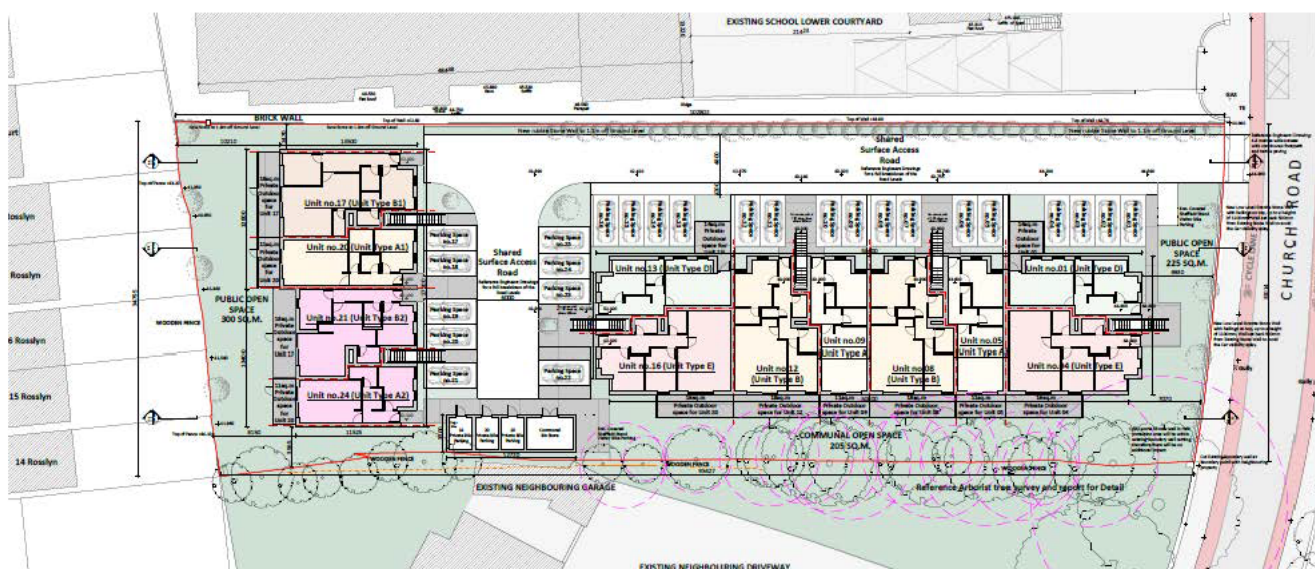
Revised Layout plan for CFI- Permitted Layout (May 2024) (Source: ODKM Architects)
